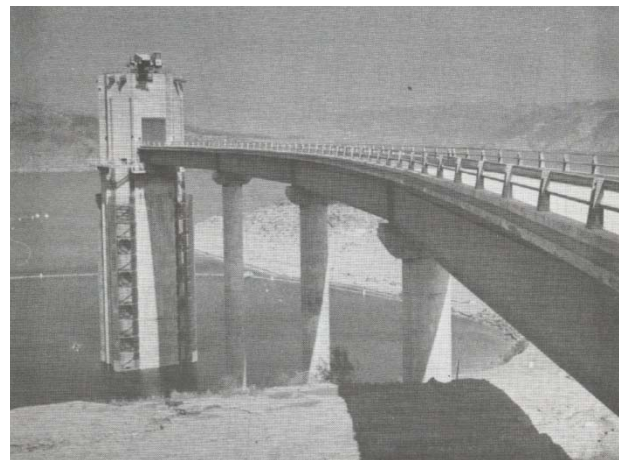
High Intake Tower at Castaic Dam Outlet Works (DWR Photo.)
